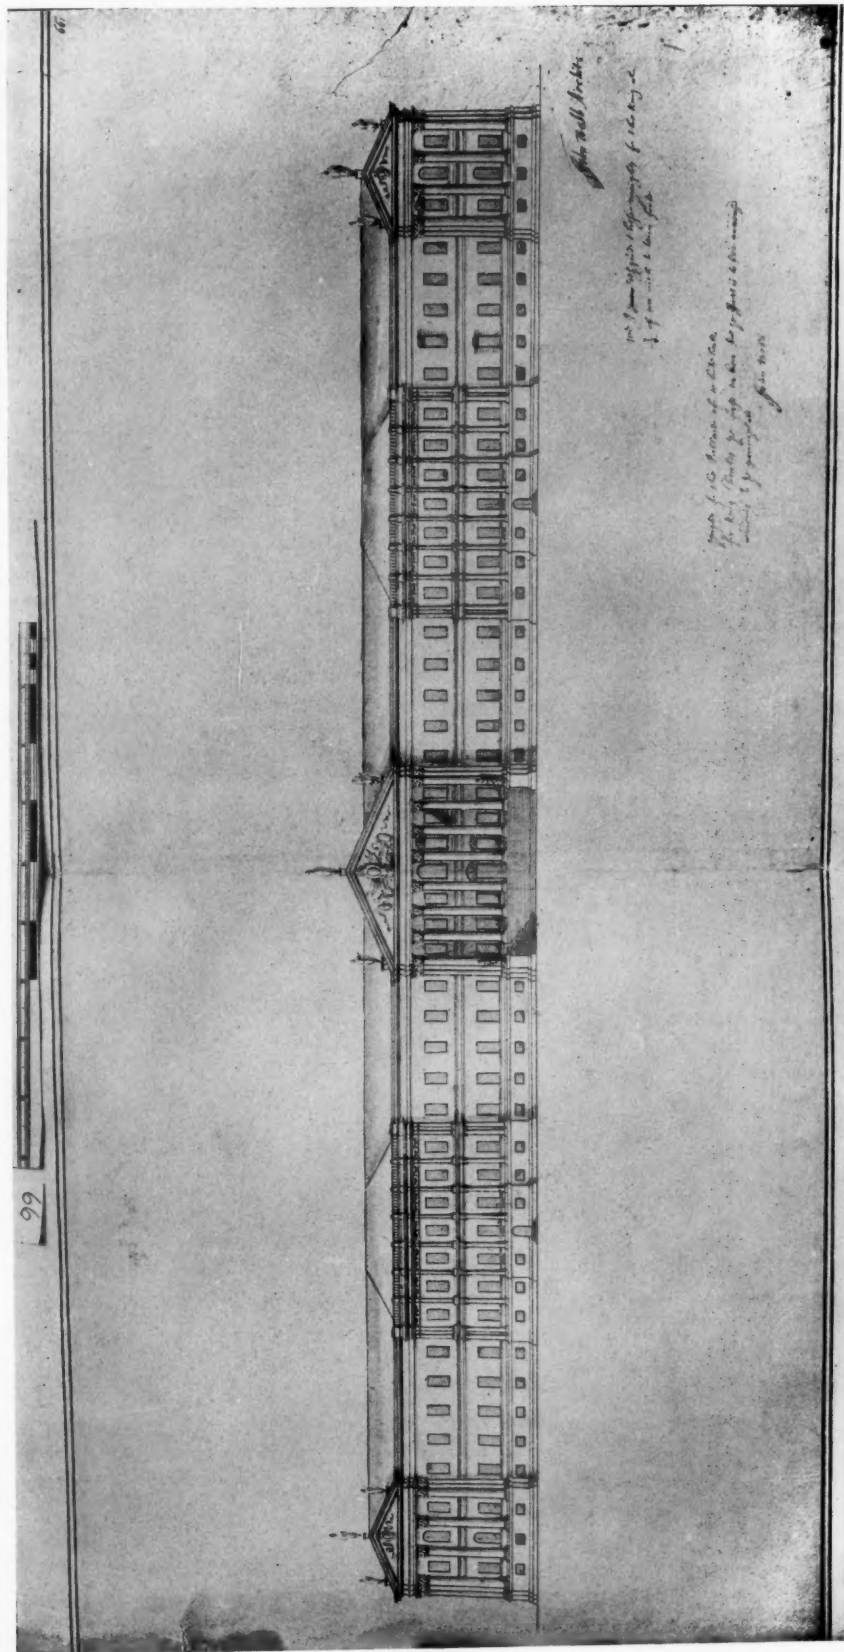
ELEVATION AGREEING WITH PLAN FIG. 16, SIGNED BY JOHN WEBB
